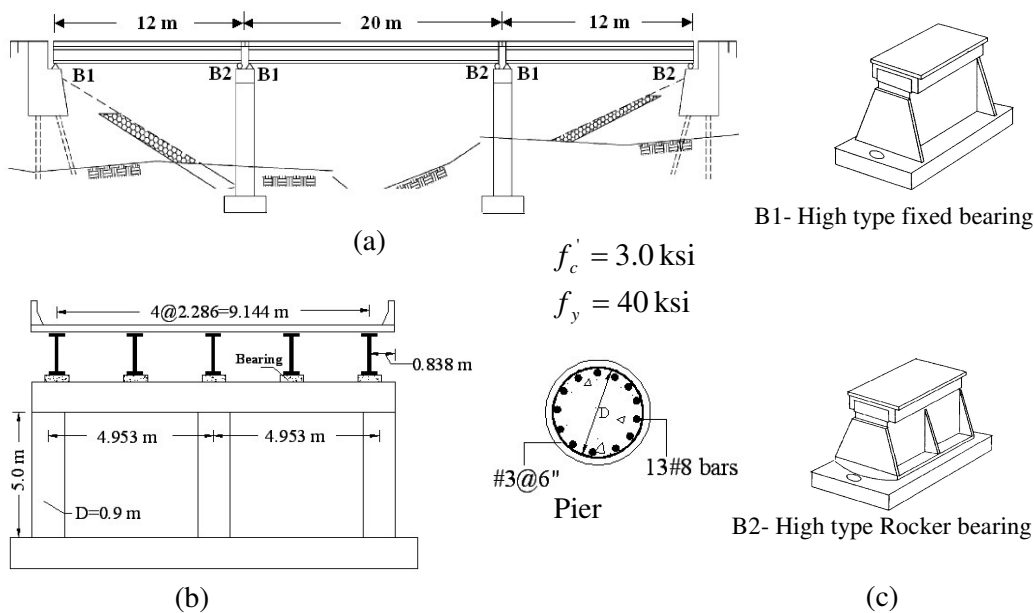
Configuration of a Typical Multi-span Simply Supported Steel Girder Bridge in New York State (a) Elevation; (b) Transverse cross-section; (c) Bearings.
